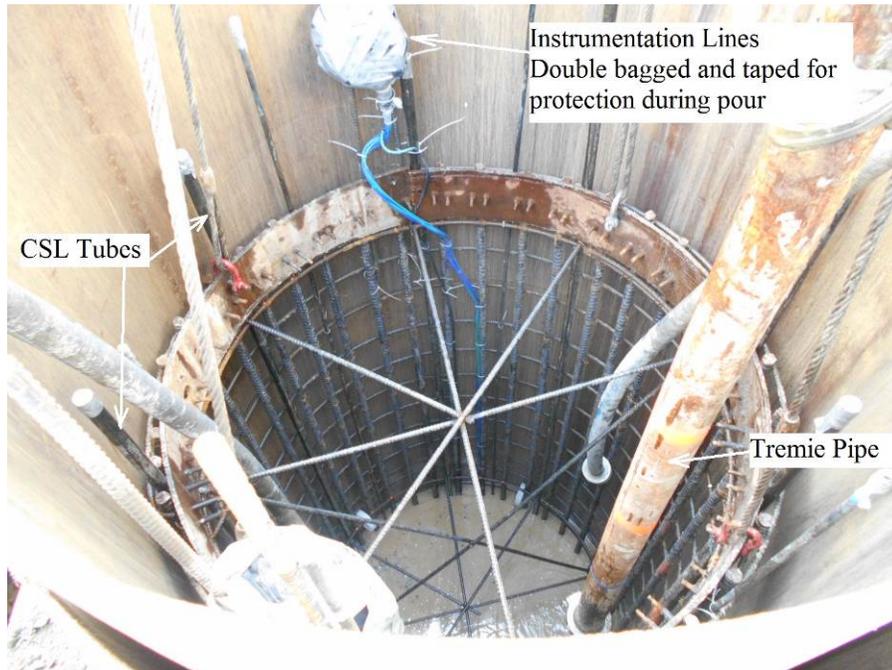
Setting steel reinforcement cage with O-cell assembly into shaft
